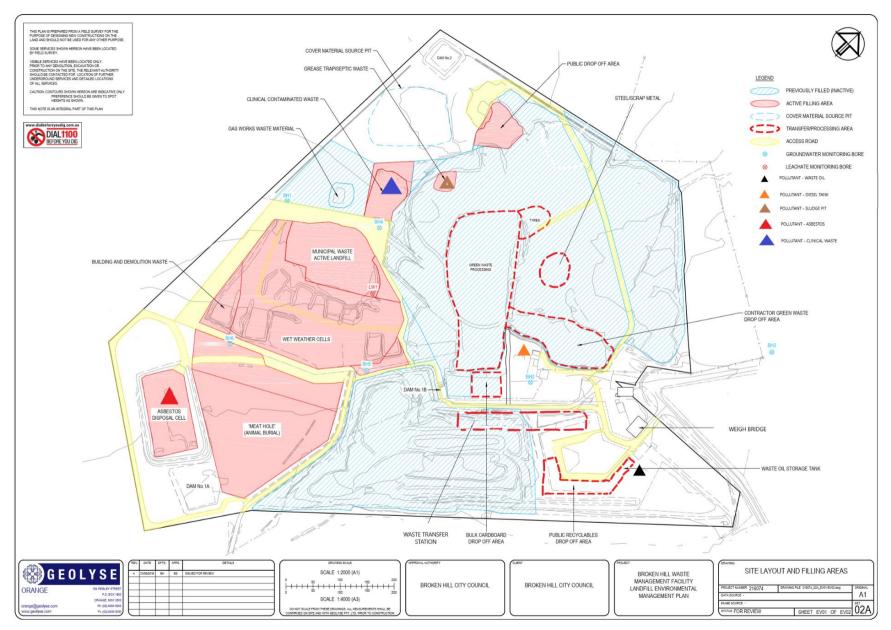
Broken Hill Waste Management Facility Layout Plan showing pollutant locations
